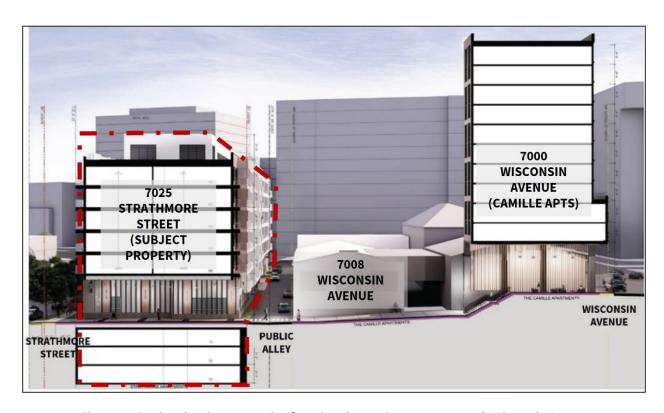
Section showing connection from Strathmore Street east towards Wisconsin Avenue
